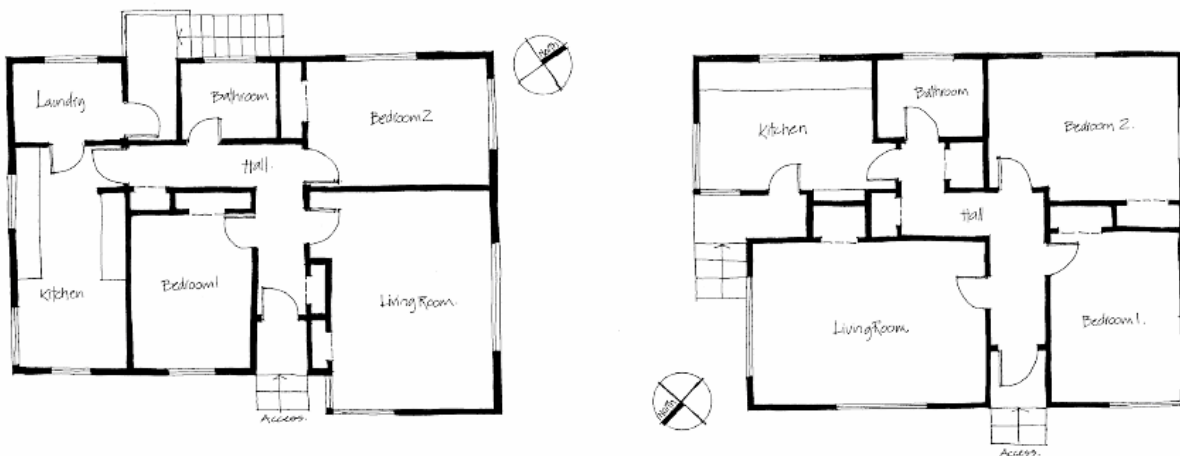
Houses Layout; House 1 (left) and House 2 (right)
